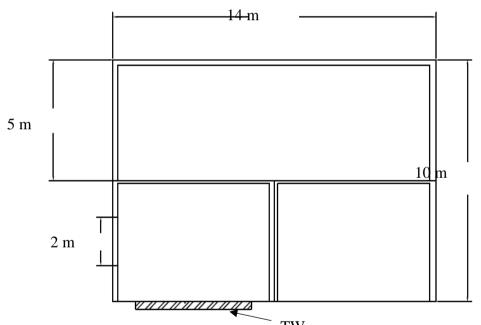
Plan view of single storey building (or ground floor of two storey building)
